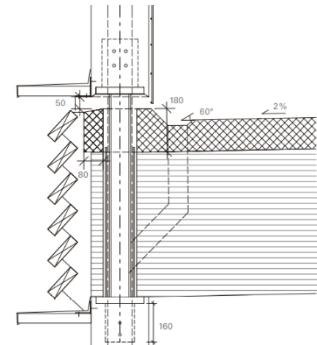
Connection of the beam and floor to column (*Development of Construction System for Multi-Storey Car Parks in BauBuche, n.d.*)
